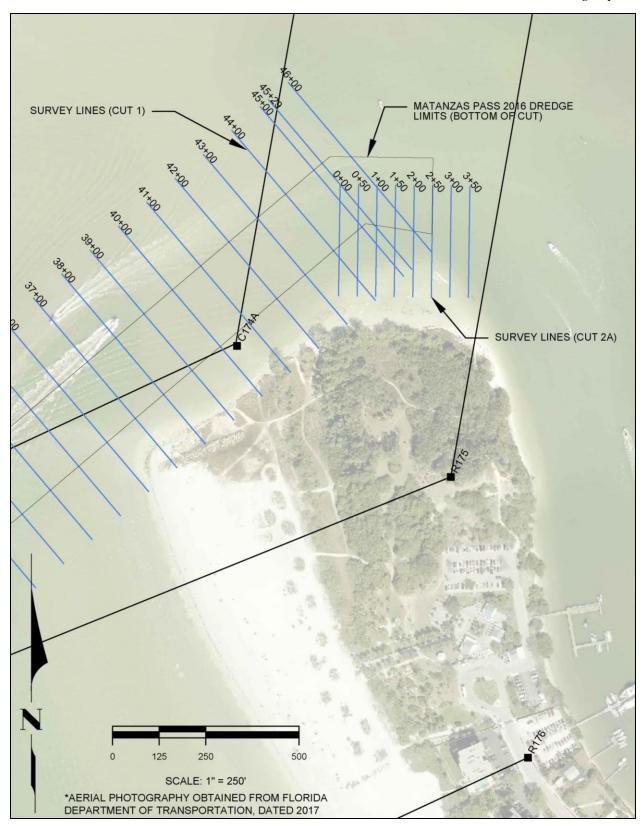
Plan View of North Adjacent Shoreline and 2016 USACE Dredging Project.
